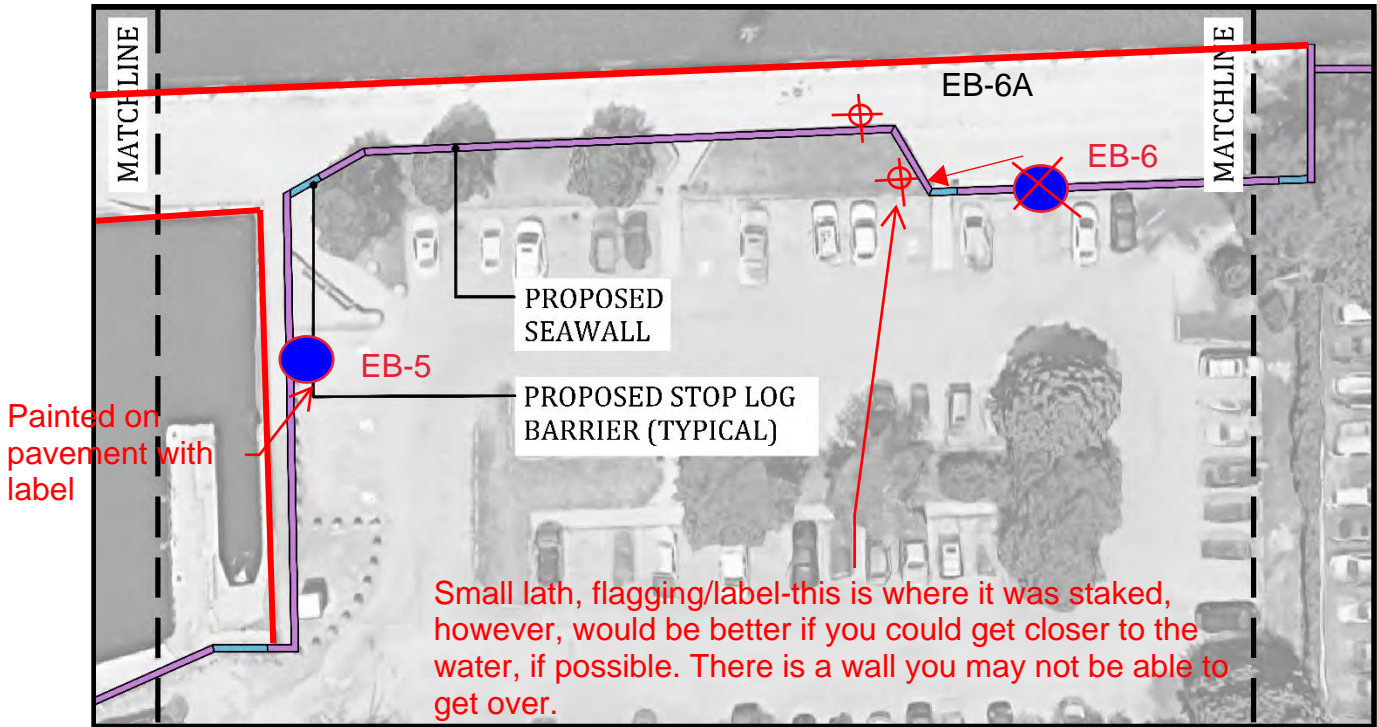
Seawall Concept Plan B: NYS-DEC Fishing Access Area
